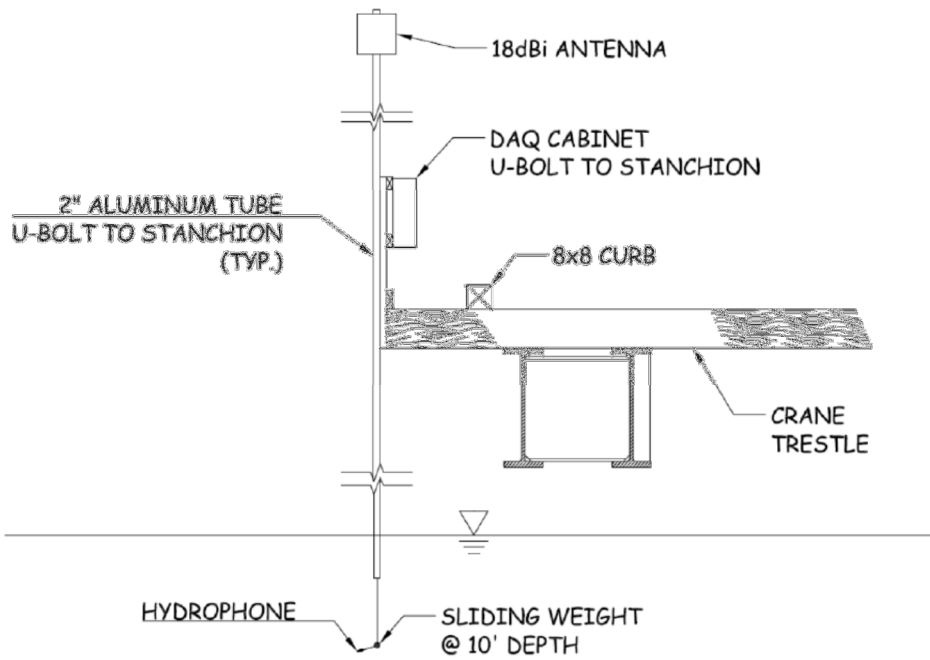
Proposed Hydrophone System Elevation on Trestle
